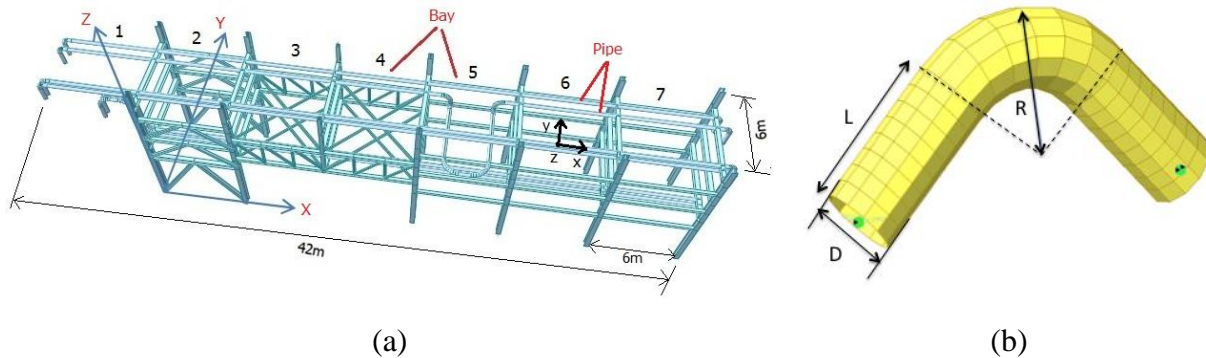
(a) The piping system considered in the Case Study; (b) shell element assemblage used for each pipe elbow.
